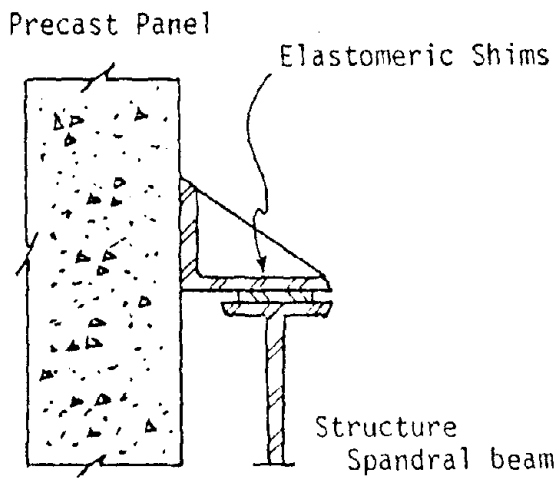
Fixed Support Welded Connection (Integrative)
